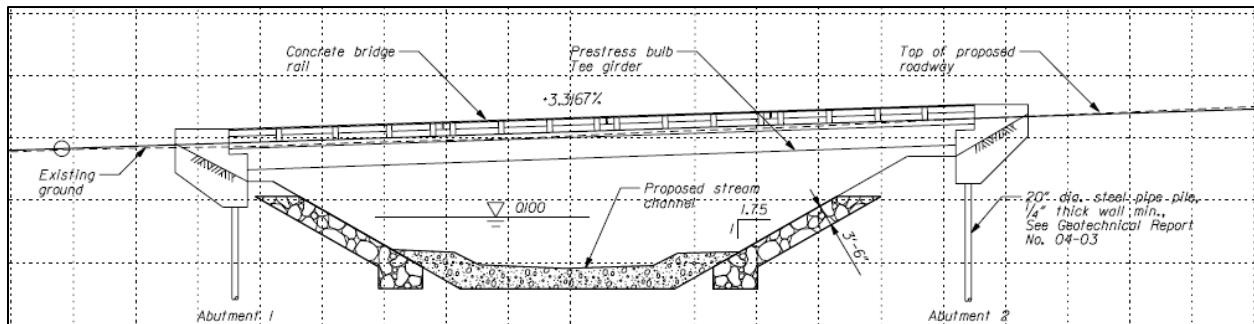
West Twin Creek Bridge – Cross section view of riprap design.
